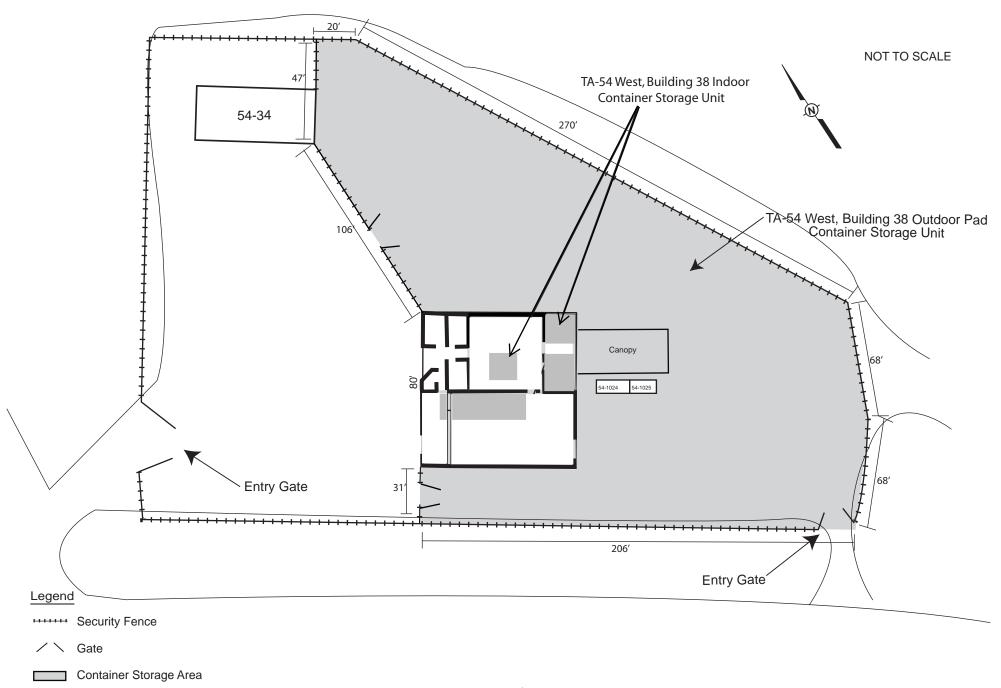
Technical Area (TA) 54 West, Building 38 Indoor (High Bay and Low Bay) and Outdoor Pad
